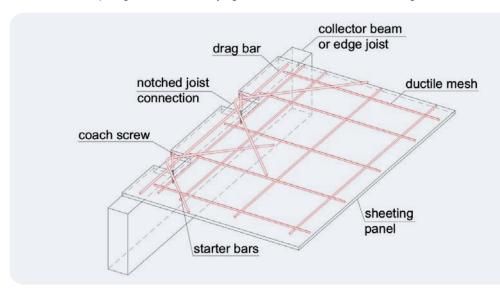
Suggested connection between the concrete topping and timber beams.
